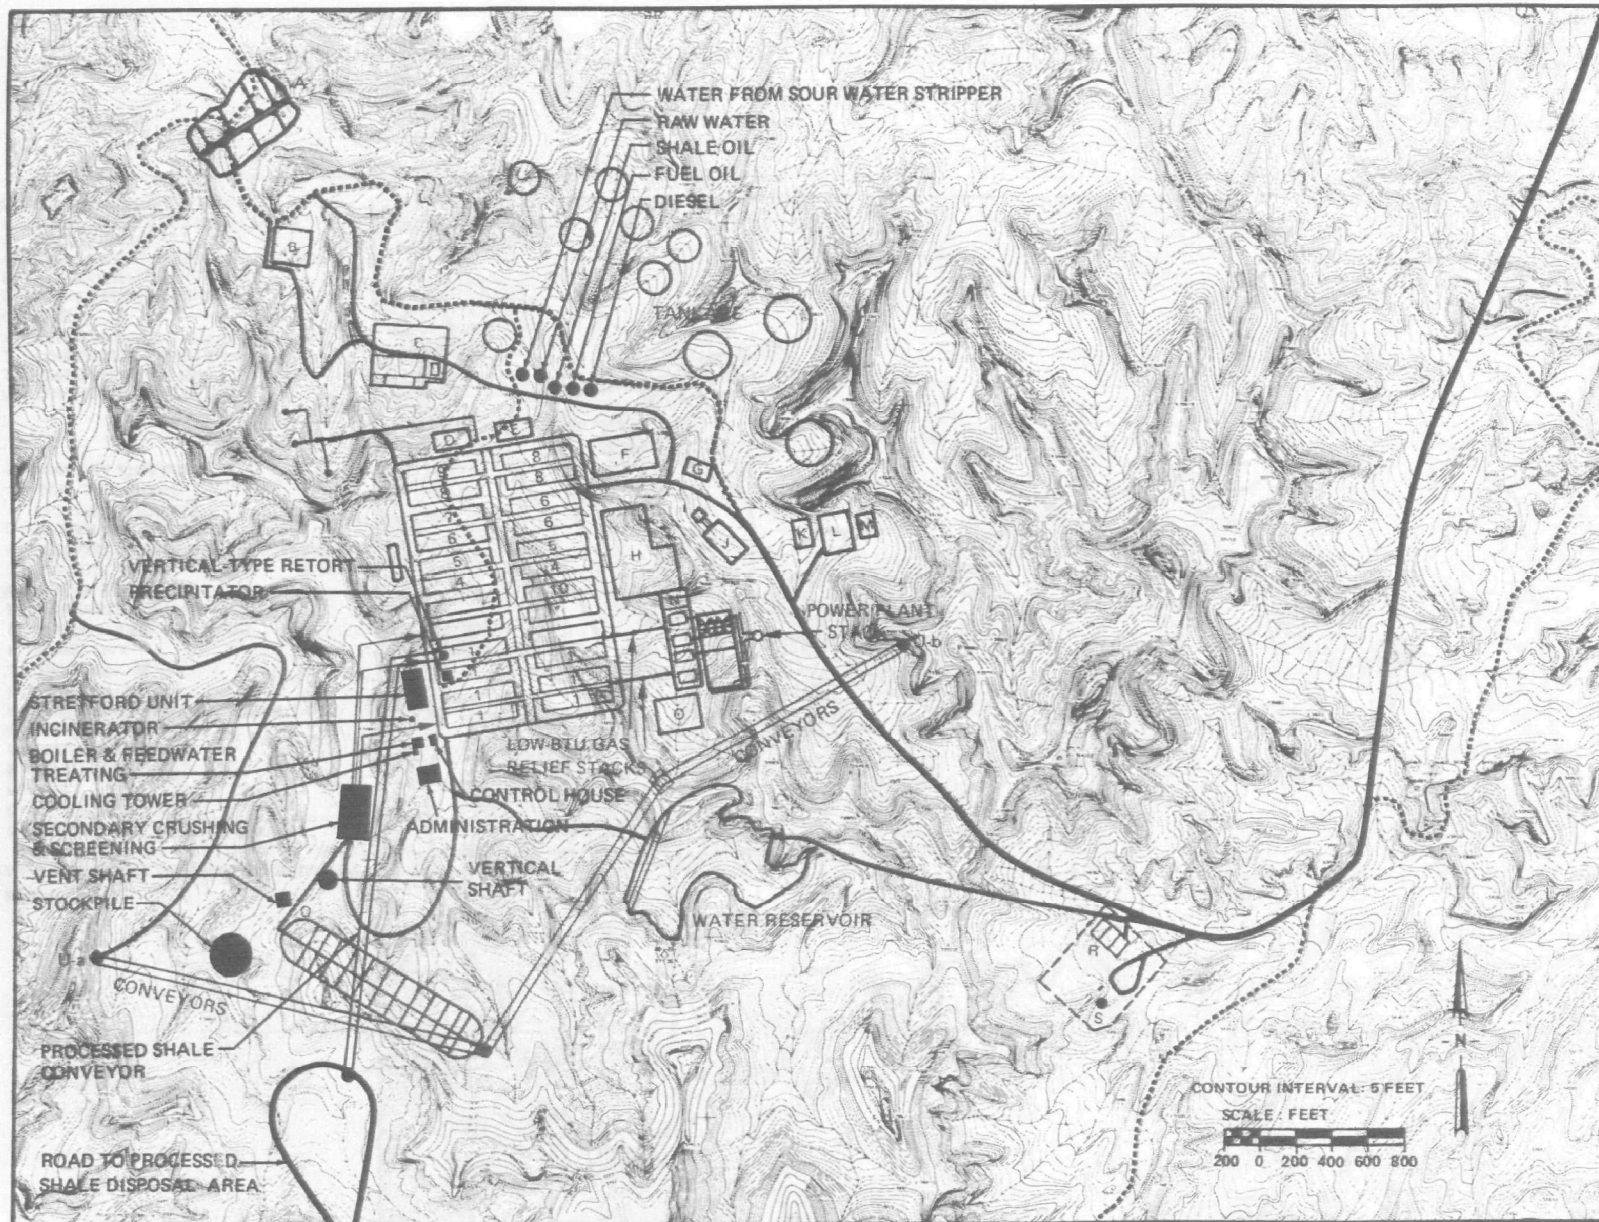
General site plan for development of Tracts U-a and U-b.
